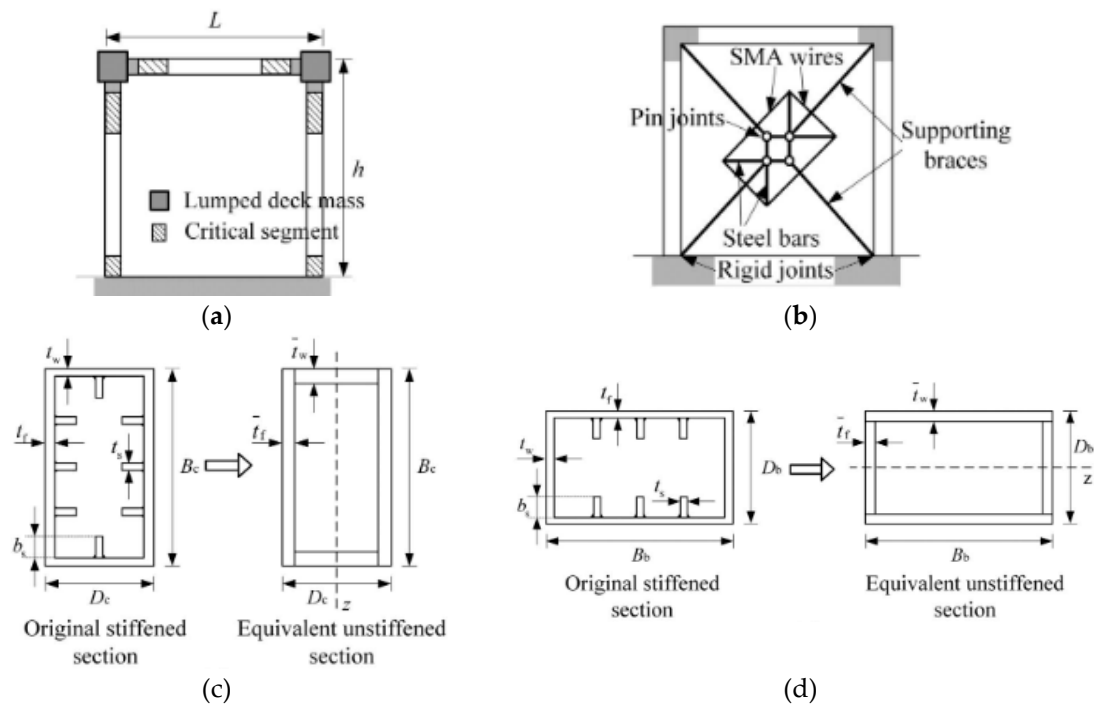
Model of bridge pier[95]: (a) Main frame; (b) Bridge pier with DX-SMA damper; (c) Column section; (d) Beam section.
